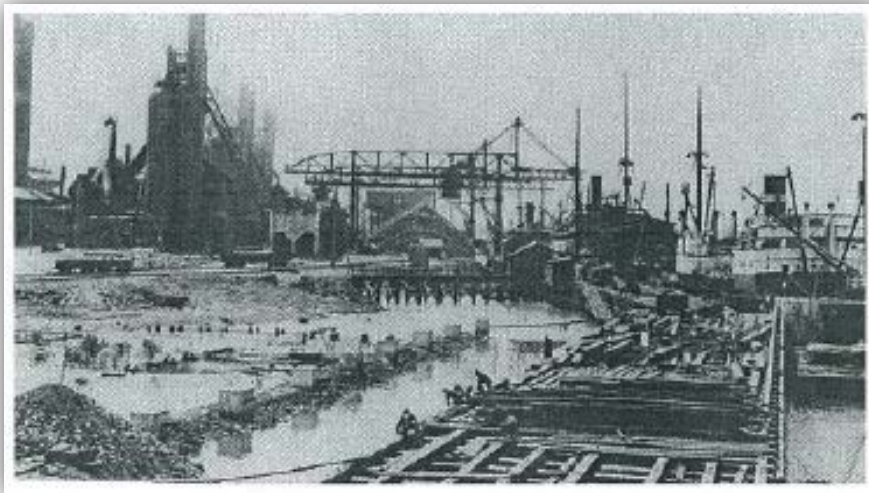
Construction of the BHP Steelworks Wharf in 1912
